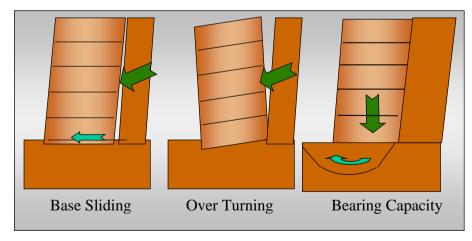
EXTERNAL STABILITY CHECKS CONSIST OF
